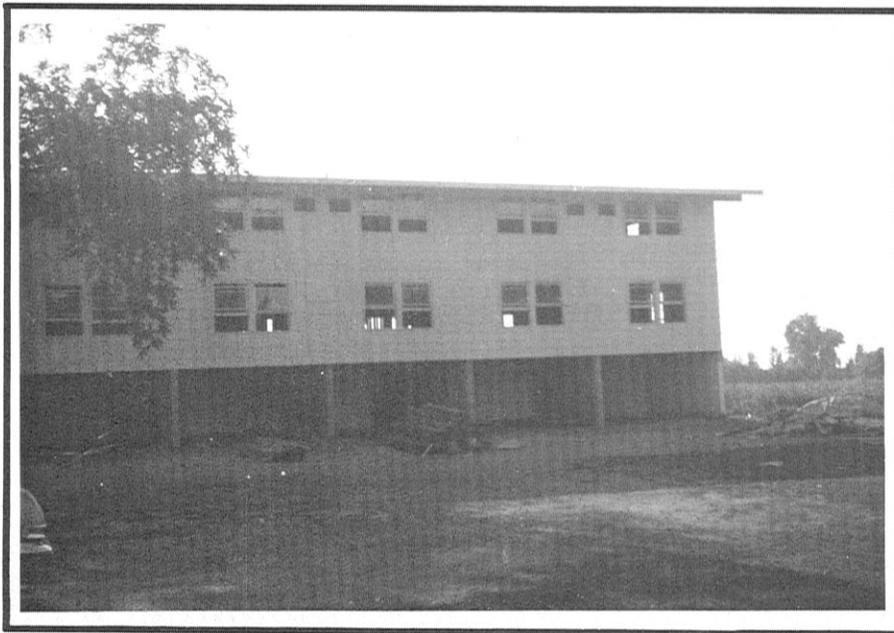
Looking downstream at construction on the Squaw Creek flood plain. The building is designed to incur a minimum amount of damage when flooded. It is located near mile 1.00q.
